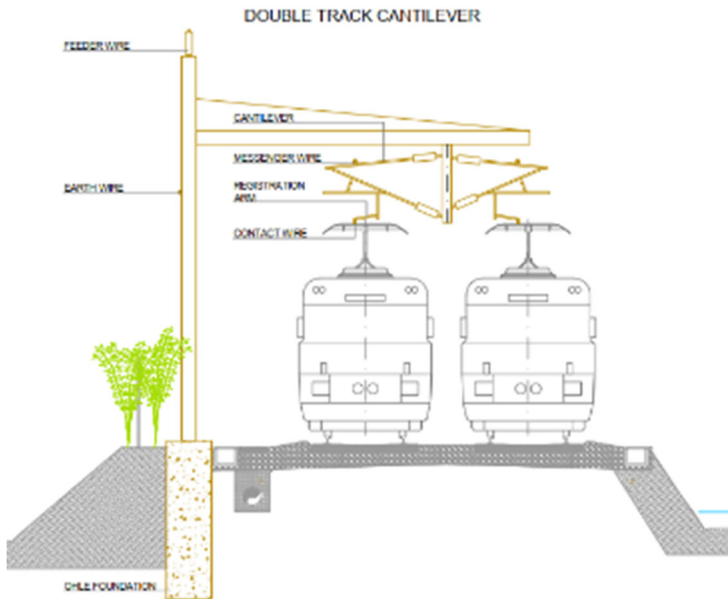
Typical OHLE Arrangement in Two Track Open Route – Facing East
